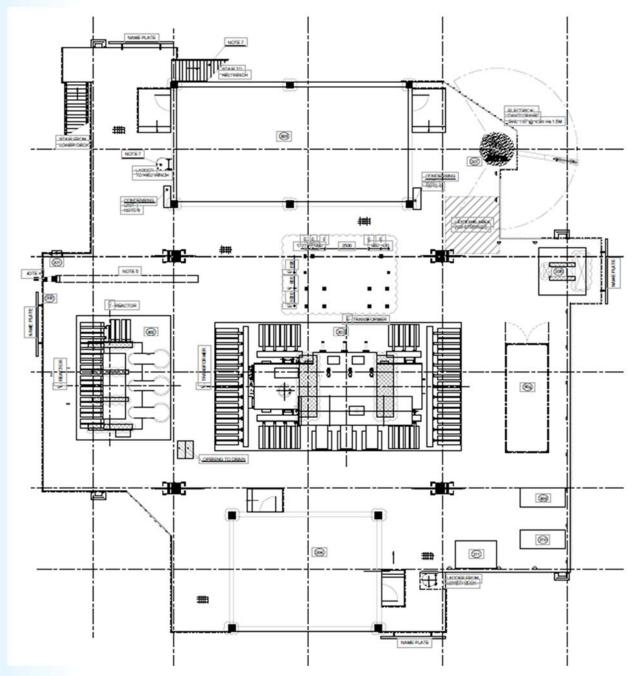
OSP general arrangement – plan view of topside upper deck
